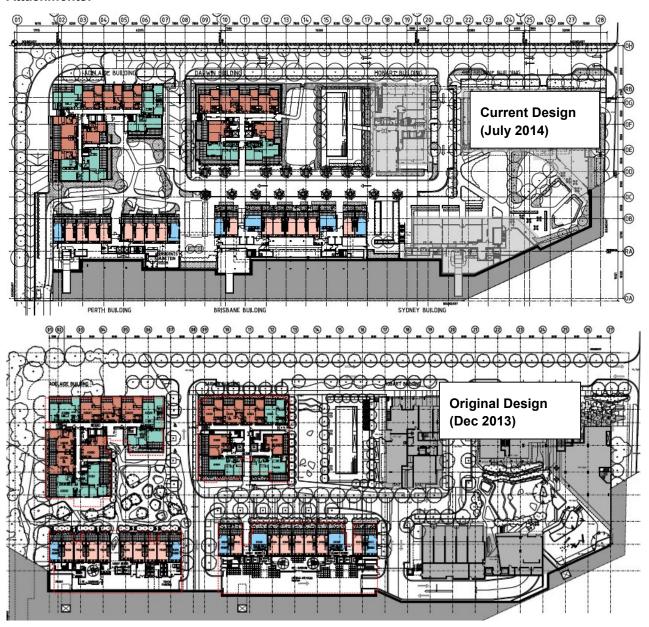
Lower ground floor plan for the <u>Maquarie Park Village</u> development – comparison between current design and design previously assessed (Stage 1: Building A, B, D and P)
